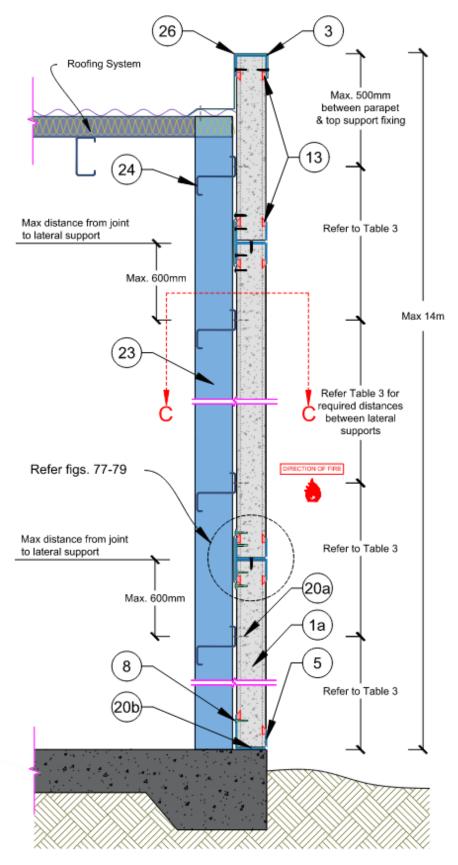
Speedpanel wall with unprotected framing at one side – Z-purlin option
